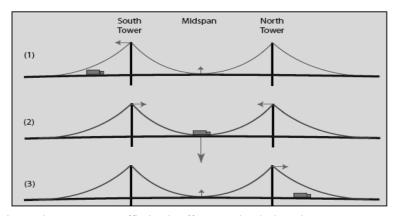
The geometry traffic loads affects on the deck and towers movement
